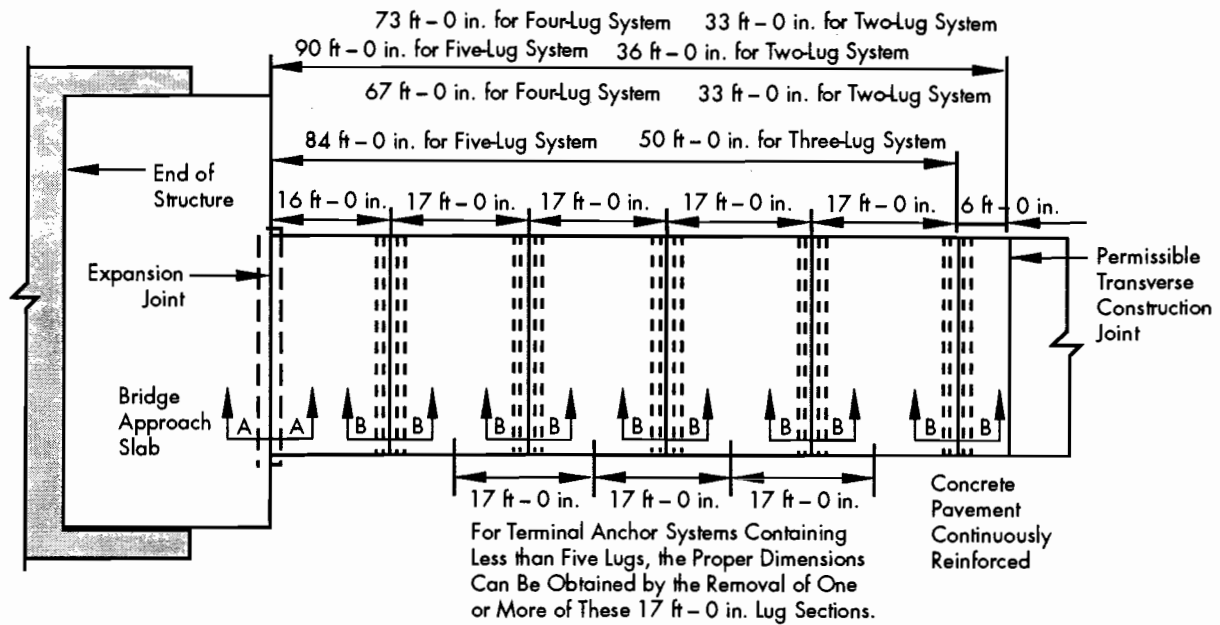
Typical terminal anchorage for use in CRC pavements (Ref 13)
